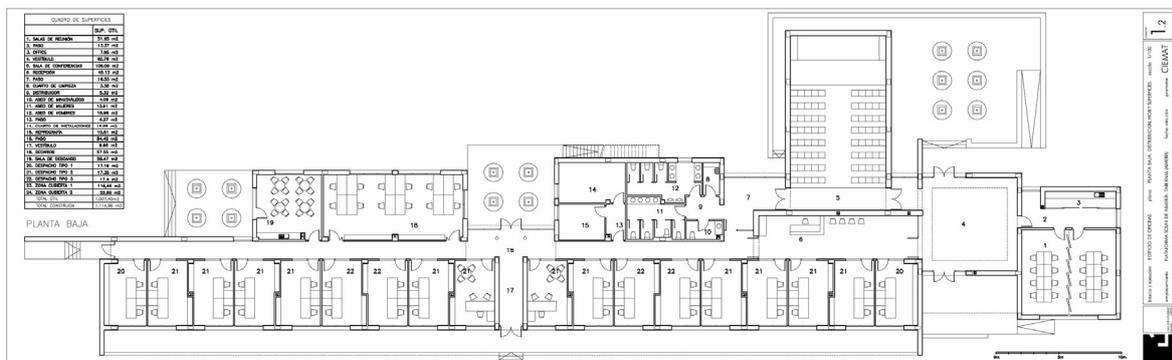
Floor plan of the new PSA technical building (PSE-ARFRISOL SP4).
